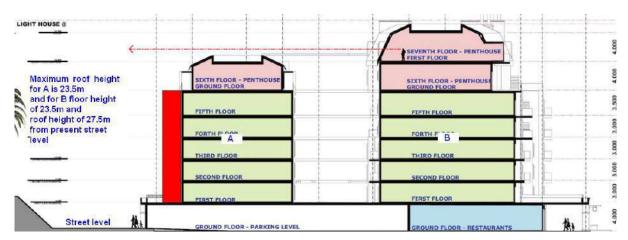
ROOF HEIGHT FROM GROUND LEVEL
